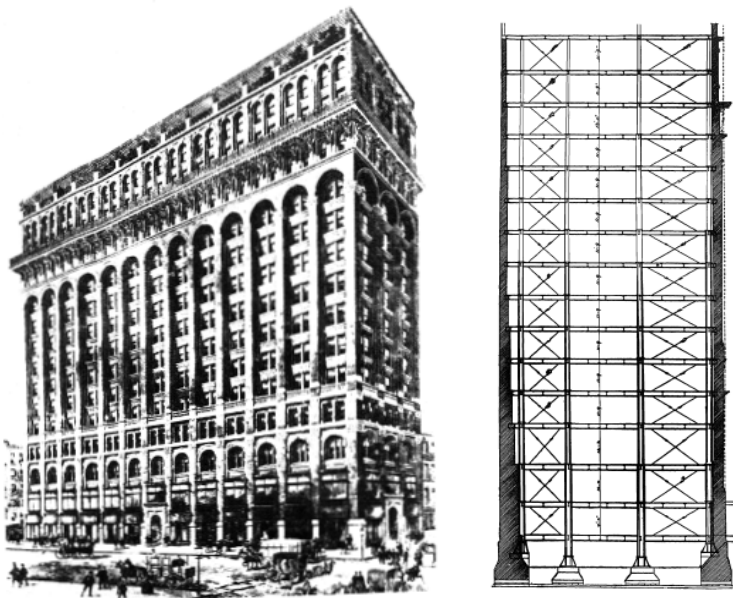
Havemeyer Building Cross section of Havemeyer Building
